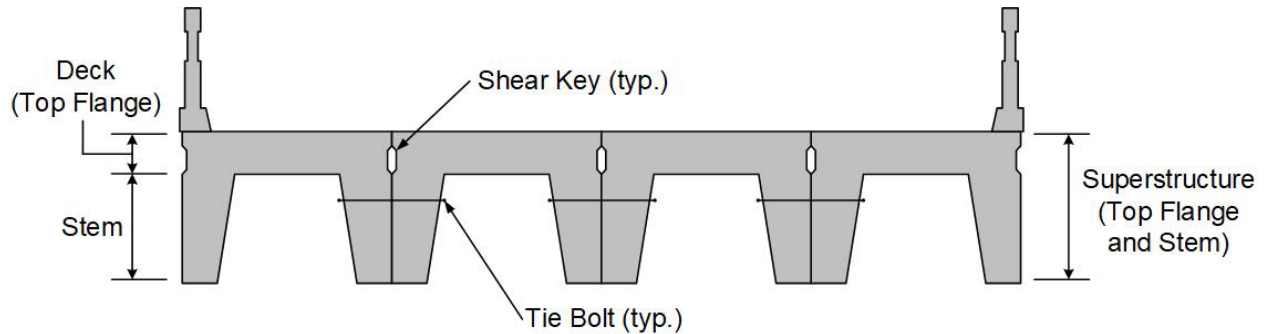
Cross Section - Precast Channel Beams with Tie Bolts and Shear Keys
